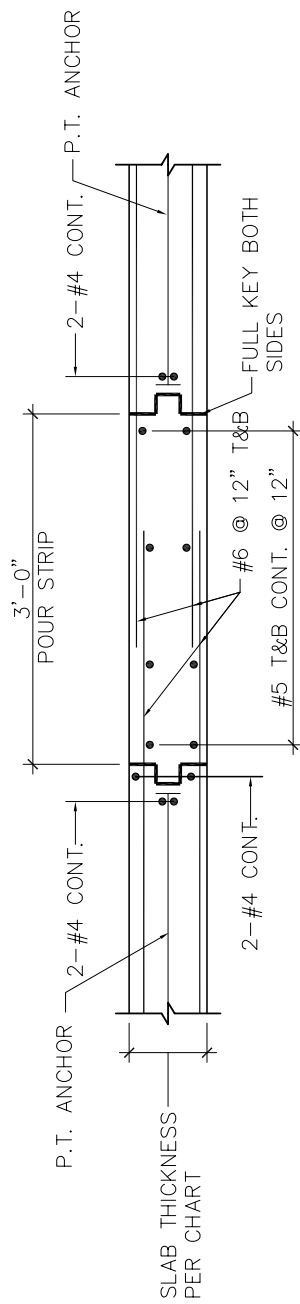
Typical Post-Tensioned Slab Profiles
